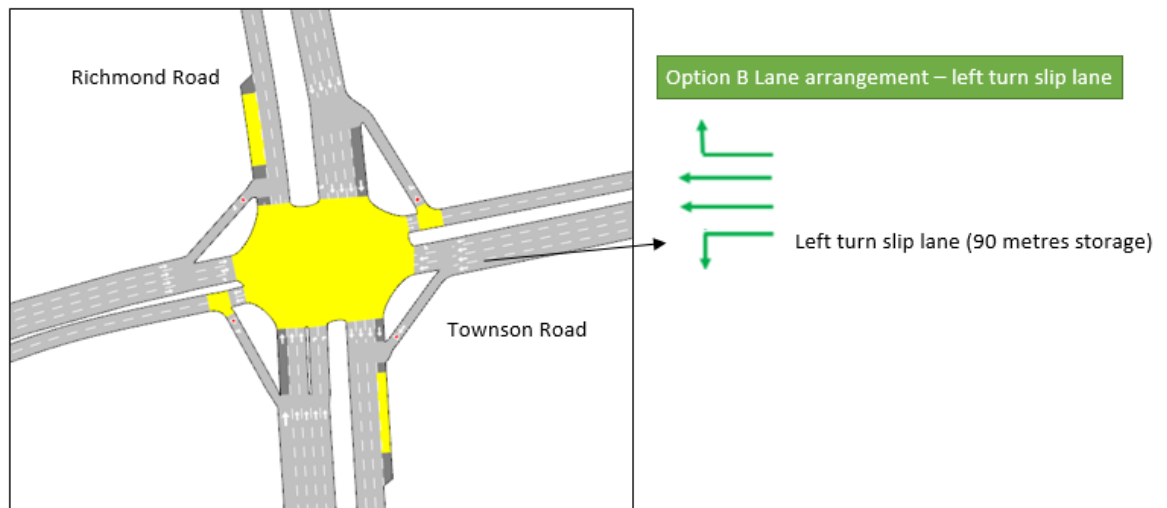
Intersection layout at Richmond Road and Townson Road
